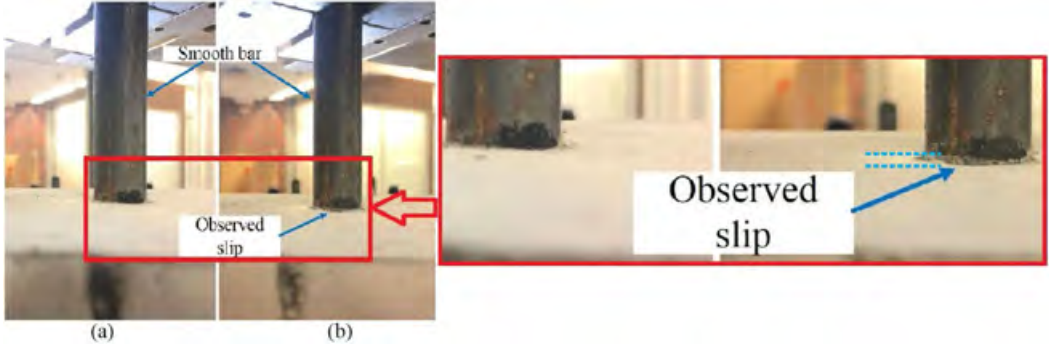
Reinforcement-concrete interface at the end of the s.40.1 specimen (a) before; (b) after loading.
